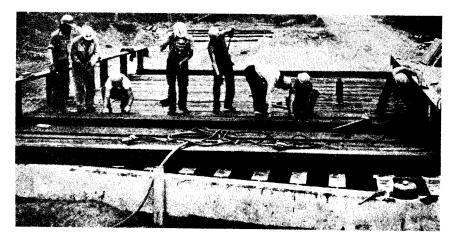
Timbers placed and connected to steel stringers over Elkhorn Creek on Rte. 686 in Pittsylvania County.
